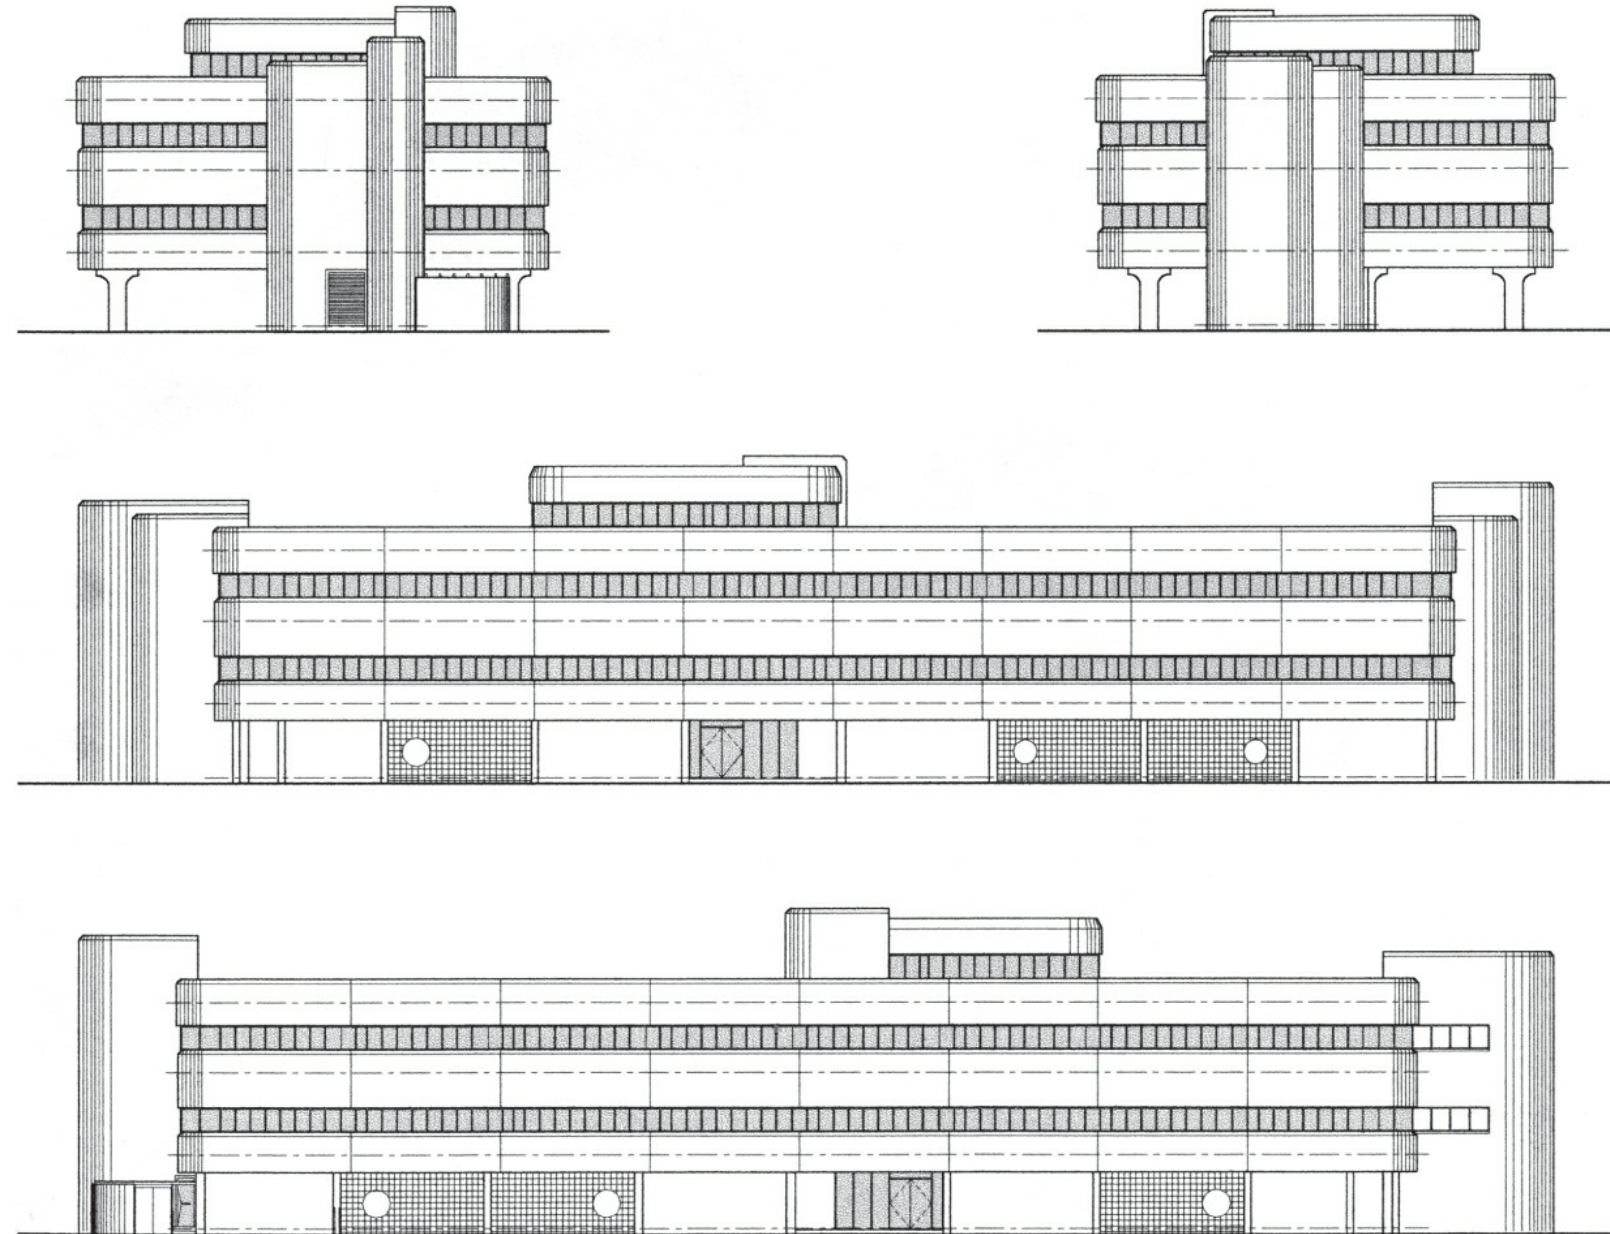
Madison Building—Stage IV: Working drawings—exterior elevations.
